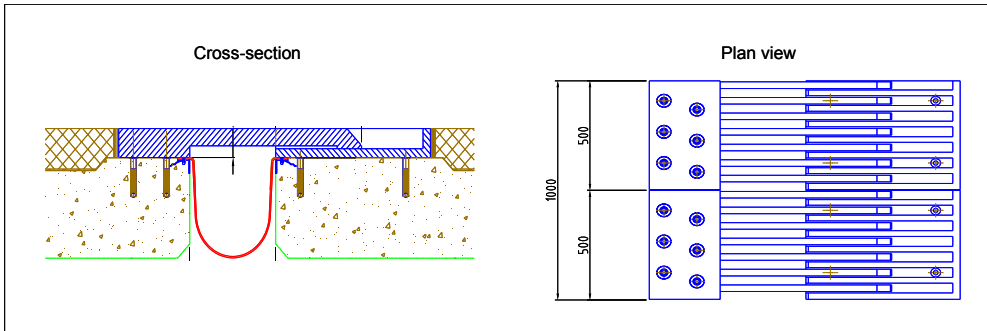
Cross Section and Plan View of Tensa®Flex Sliding Finger
